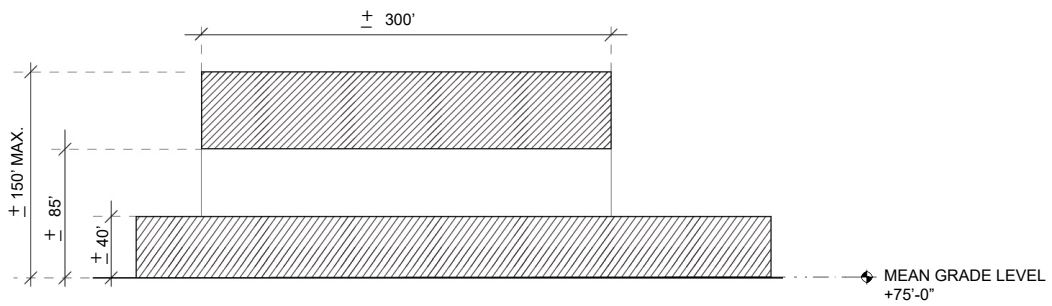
BUILDING HEIGHTS - RETAIL SITE B
